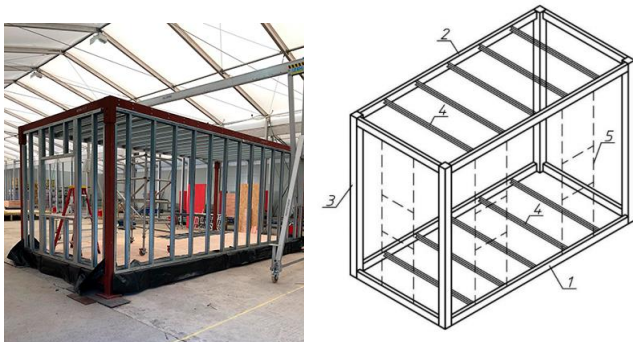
A. Frame system of modules [18]. B. Typical module frame with supporting columns 1 – lower horizontal frame; 2 - upper horizontal frame; 3 - column; 4 - flooring beams; 5 - wall fencing (if necessary) [19].
